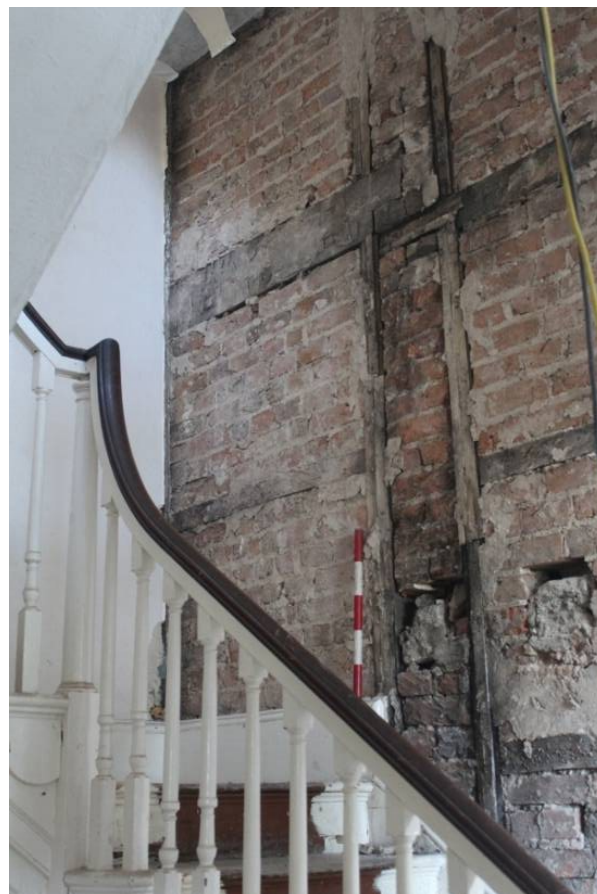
Brick wall truncated and encapsulated within internal wall of Monument House, ground floor. The wall has been axed through, but survives to the first floor; looking southeast, scale 0.5m
